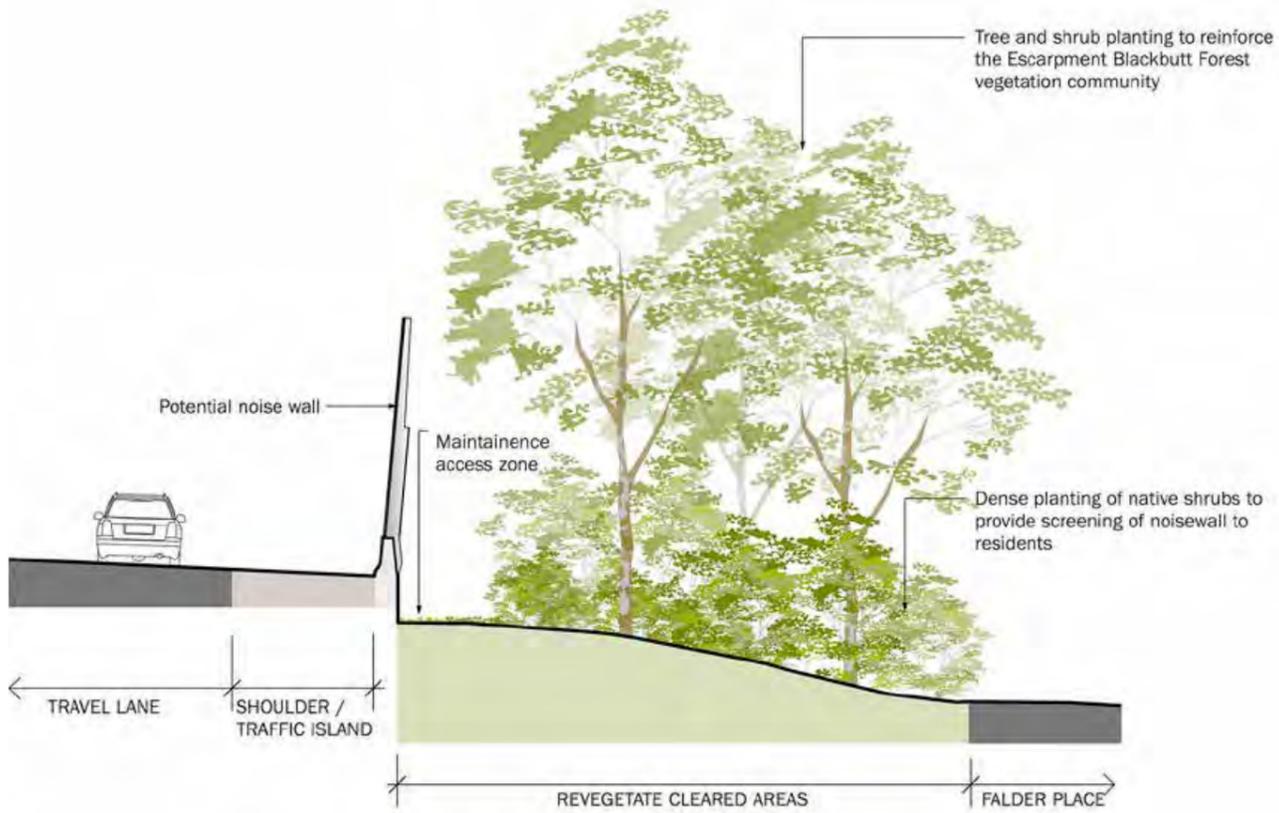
Typical section of noise wall facing Motorway - Finish type NW-F2 (Scale 1:150)
